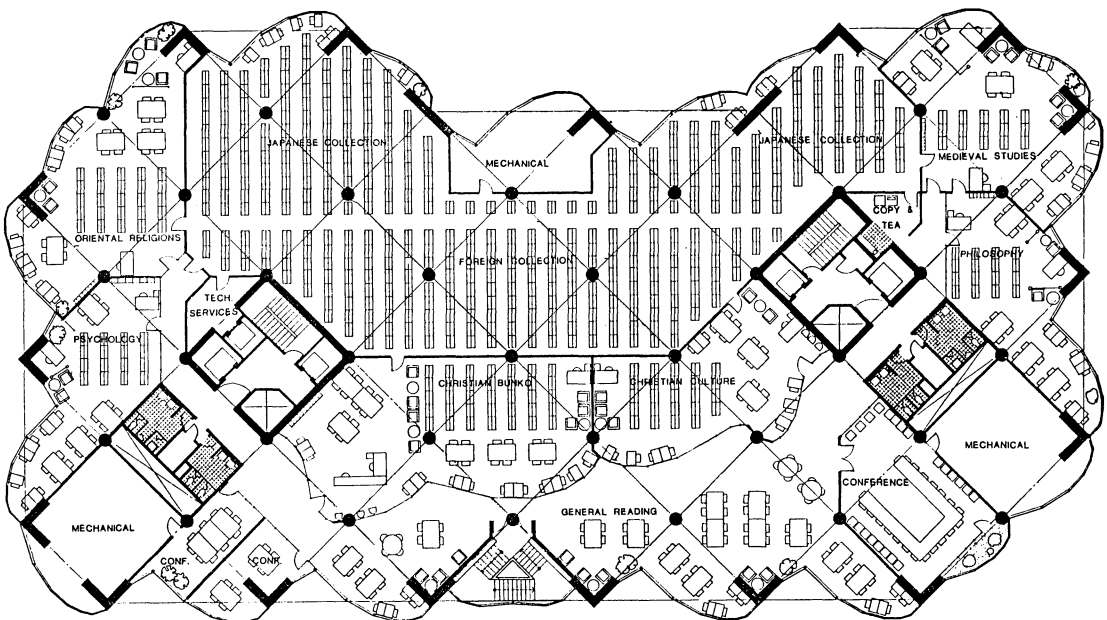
The first floor plan (eighth floor), based on a chrysanthemum pattern, designed by SOM architects.
